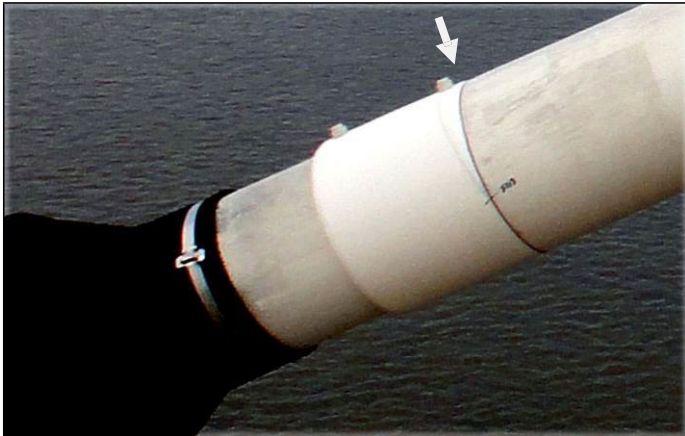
B5D: Reducer Crack Adjacent to Transition Pipe Butt Weld
